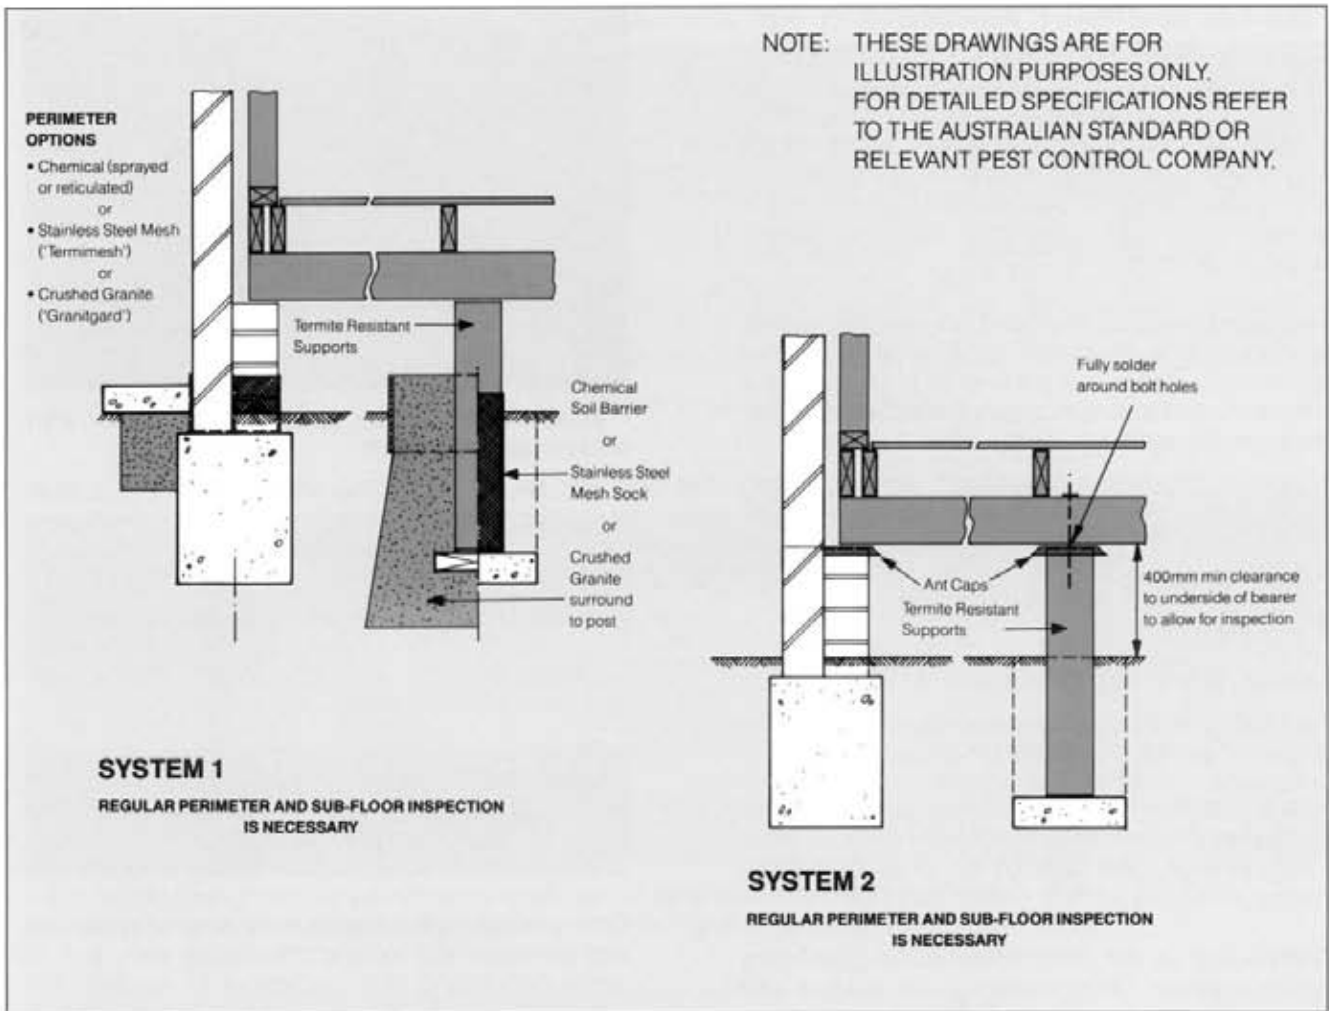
PROTECTION SYSTEMS FOR SUSPENDED TIMBER FLOORS
